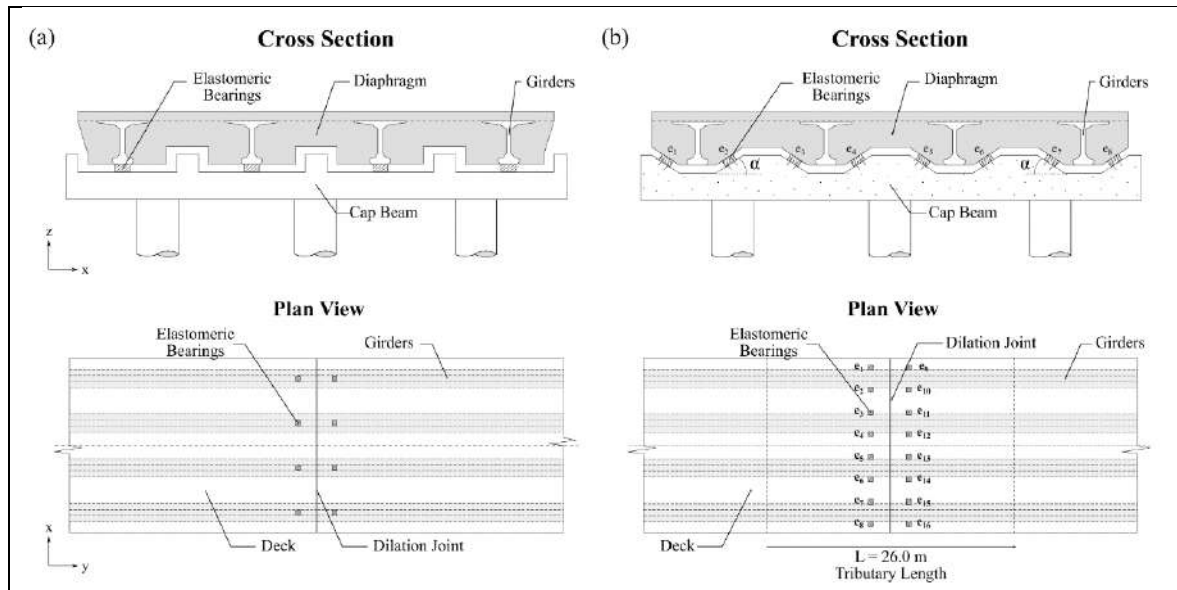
Cross-section and plan of a typical Chilean Bridge (a) Defined by the MOP [8] and (b) proposed model.
